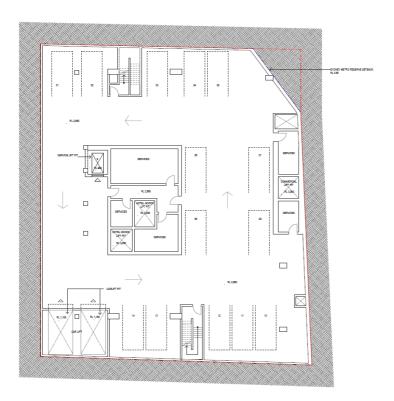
| Proposed basement level 5 (Source: Woods Bagot)
